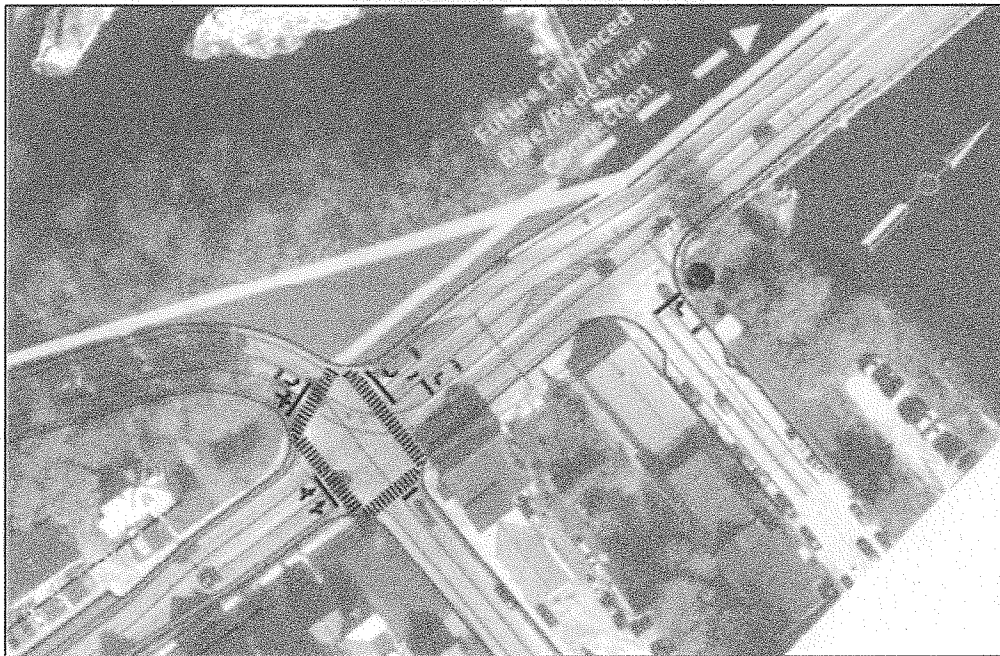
Proposed Consolidation Recommended in Colchester Avenue Corridor Plan
